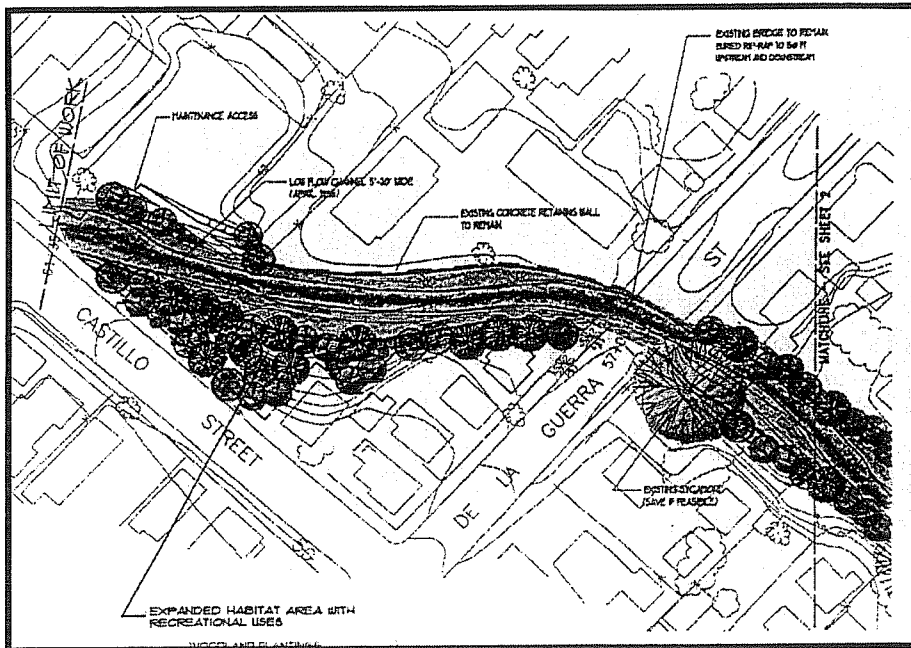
Canon Perdido and De La Guerra Street Bridges (Upstream End of the Project)
